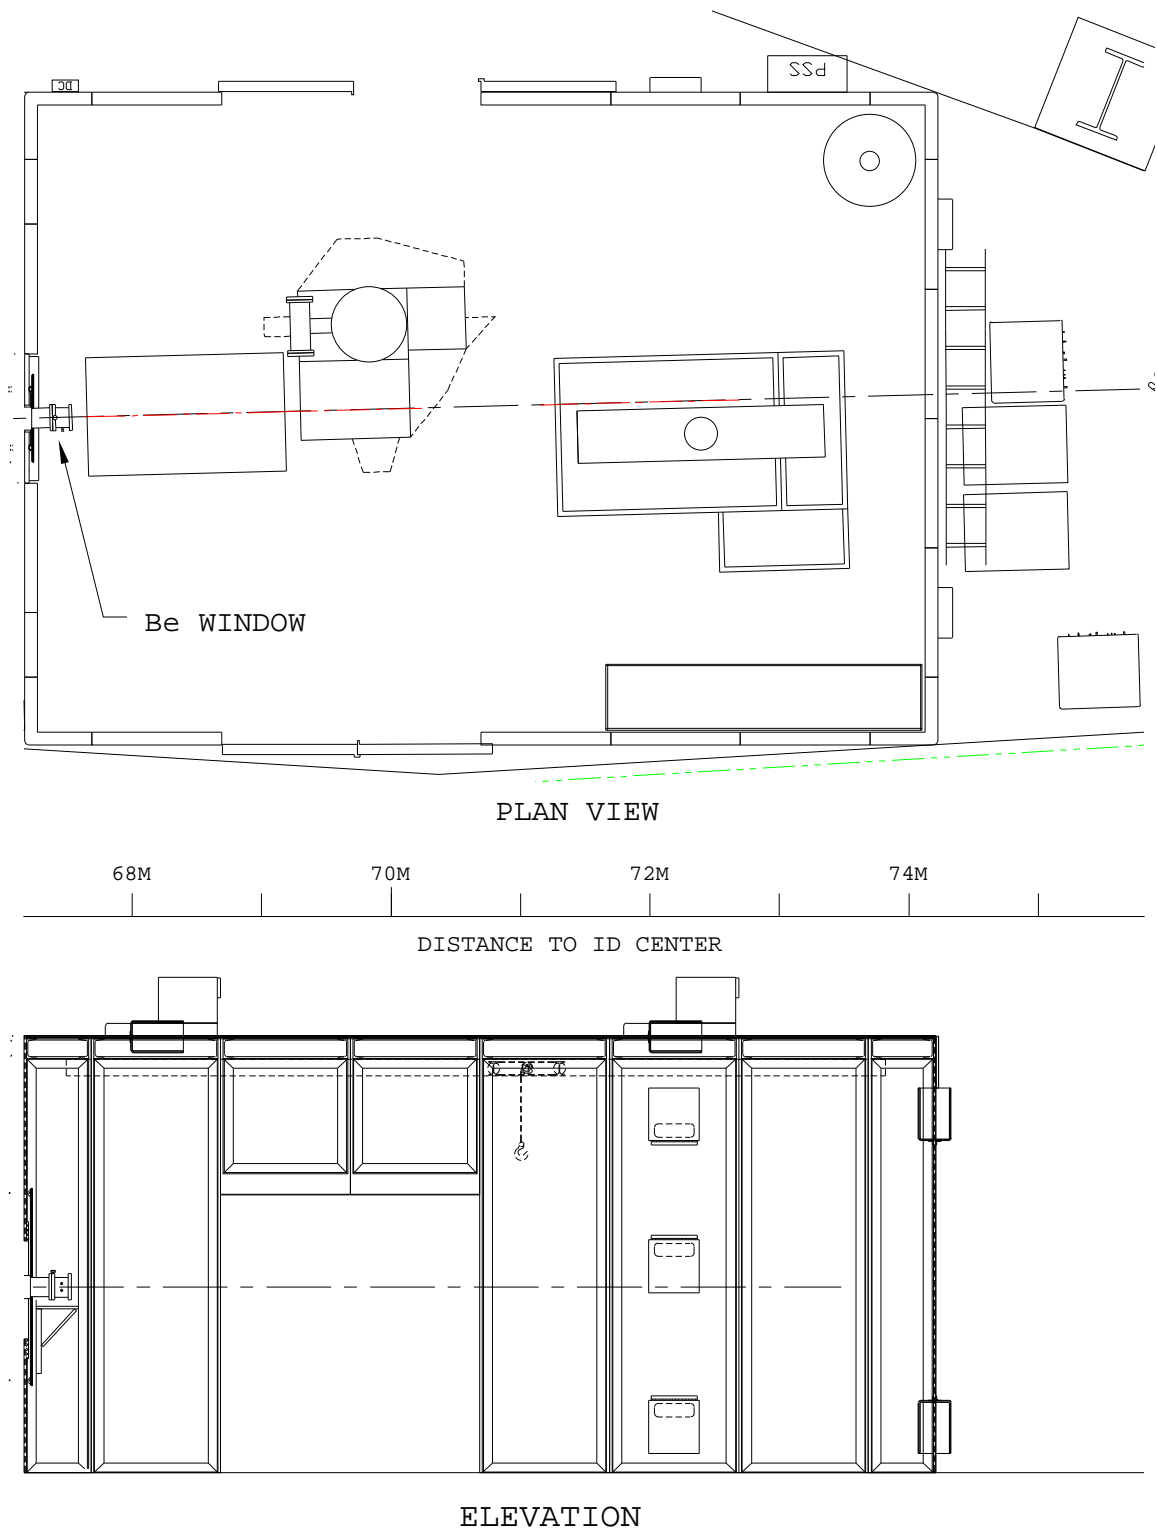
Plan and elevation views of the 12-ID-D experimental hut.
